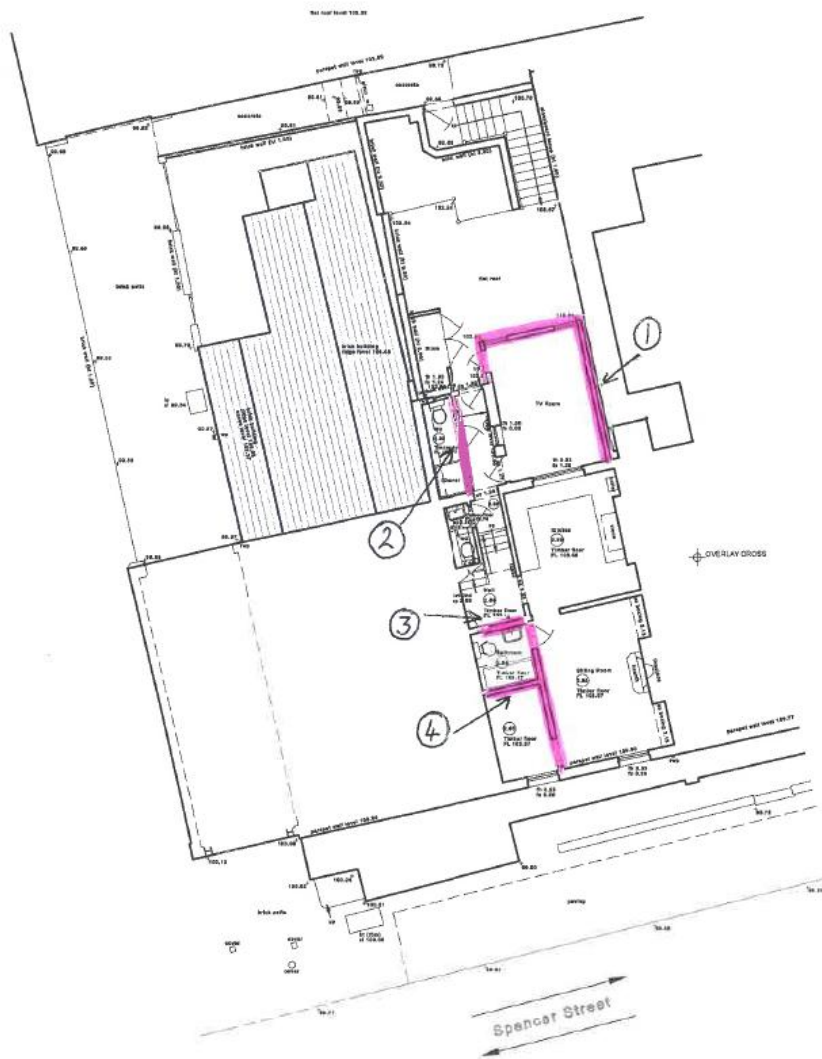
First Floor Plan, showing work items 1 - 4, as listed in the table in Section 7.1
